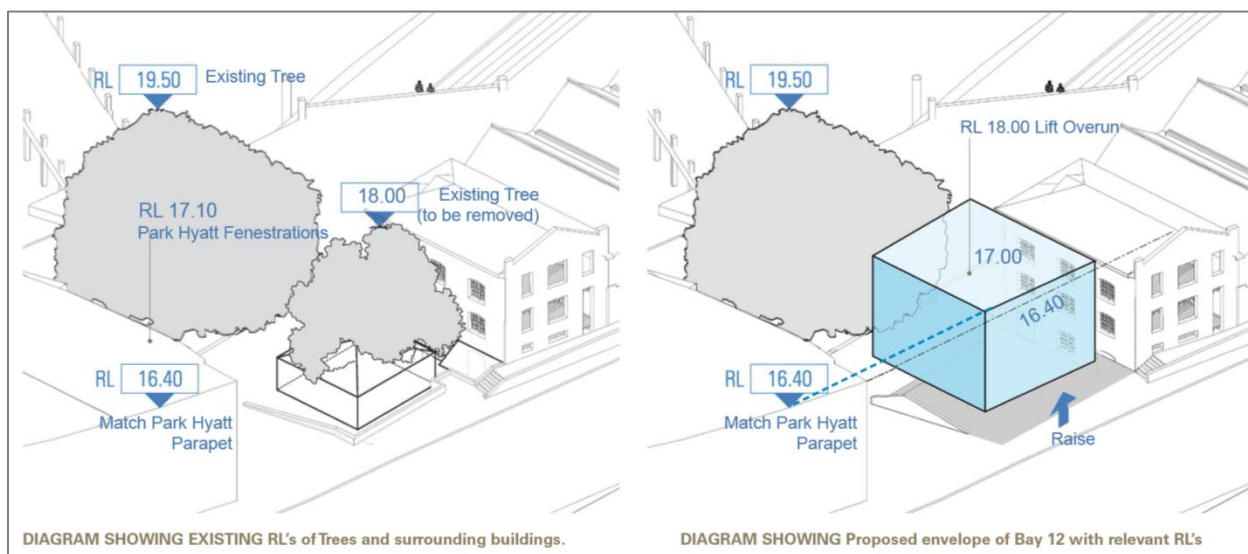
PROPOSED BAY 12 STRUCTURE (SOURCE: JPW, 2015)
